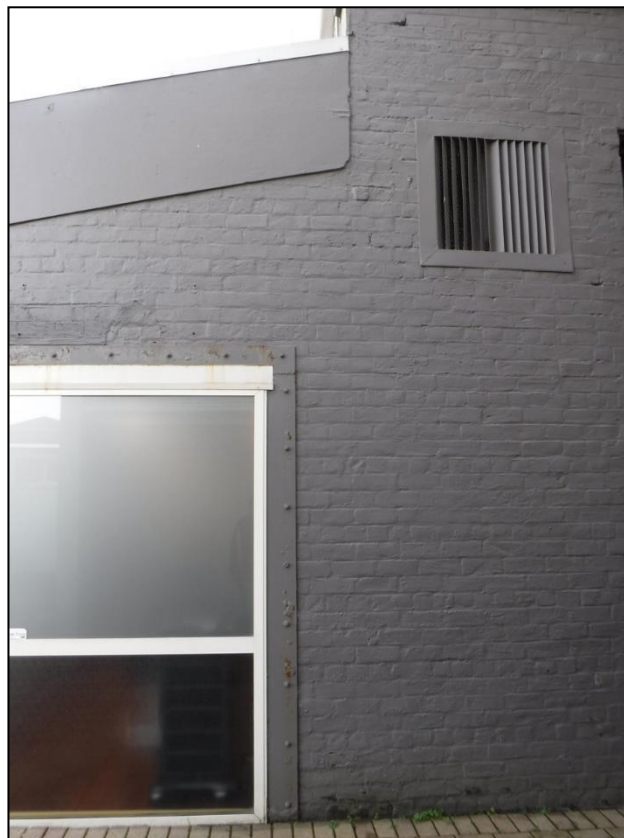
The lean-to at the south end of the east elevation. Note the steel around the modern window and scarring above it.
